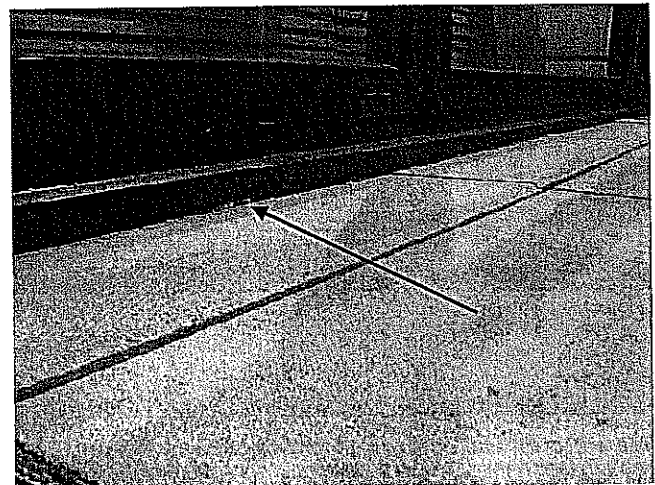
Typical deck membrane to window interface detail. The deck membrane terminates below the height of the pavers at the window locations. As a result, the concrete curb is fully exposed. This condition is highly susceptible to water ingress to the interior through any cracks in the concrete curb. This does not conform to good practice.
